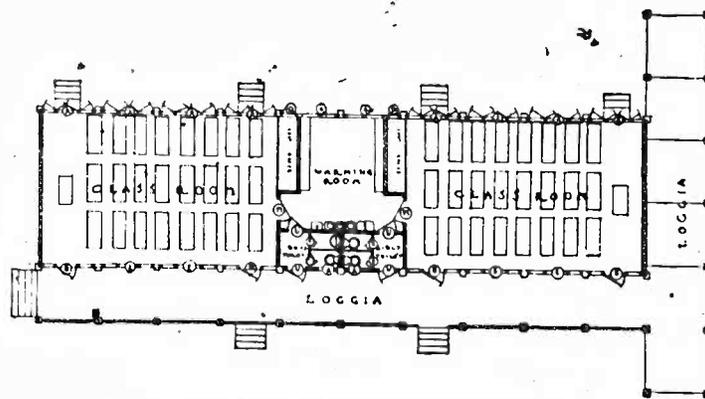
Floor plan of open-air school plant, St. Louis.
